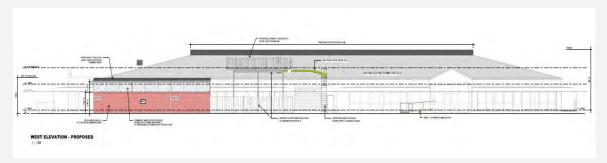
Exterior of proposed new outdoor gaming area (Source: Rob Pickett Design 2024)
